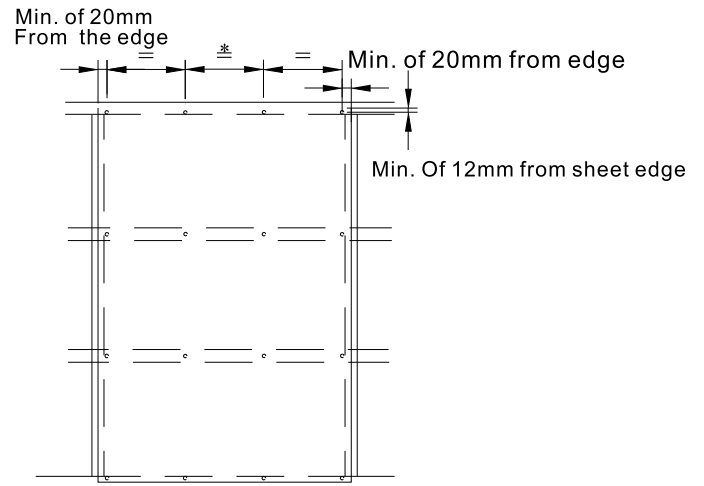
SPACINGS OF FIXINGS -1220mm WIDE SHEET PLACED ACROSS JOISTS
